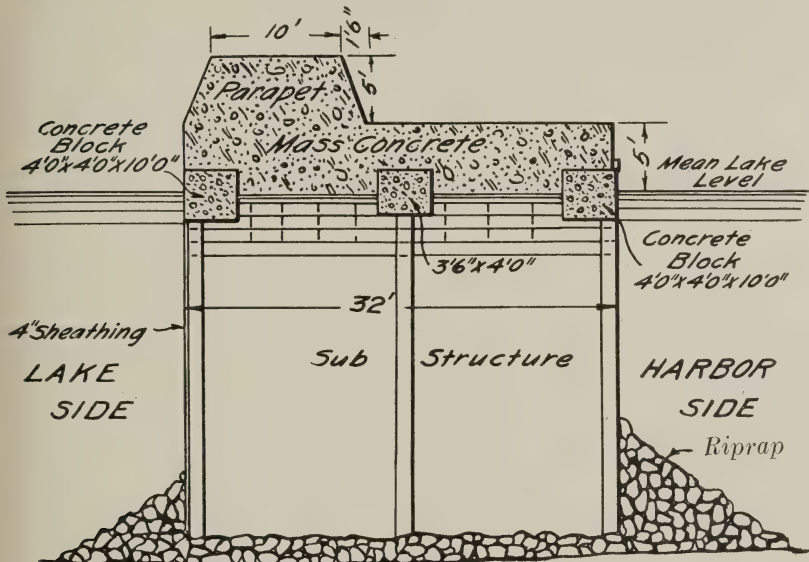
Cross section of breakwater at Cleveland Harbor, as constructed.
